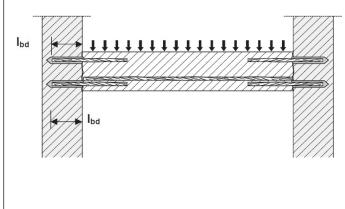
Anchoring of reinforcement to cover the line of acting tensile force
